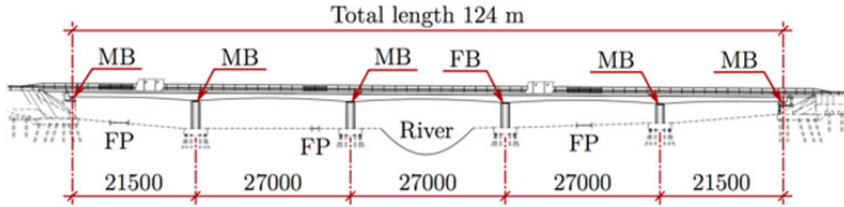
Elevation of the Bridge over Norrtälje River. MB stands for movable bearing and FB for fixed bearing (El Mourabit, 2016).
